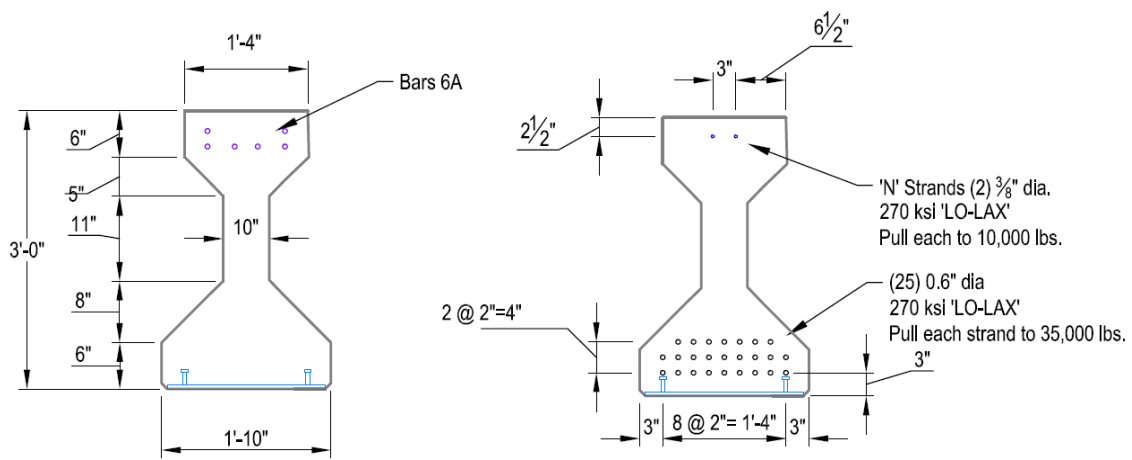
Longitudinal reinforcement and prestressing strand layout
